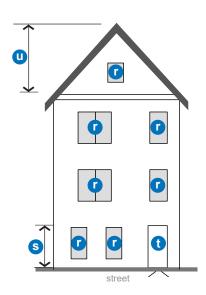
(E)(3) Yard Building: Street Facade Requirements
